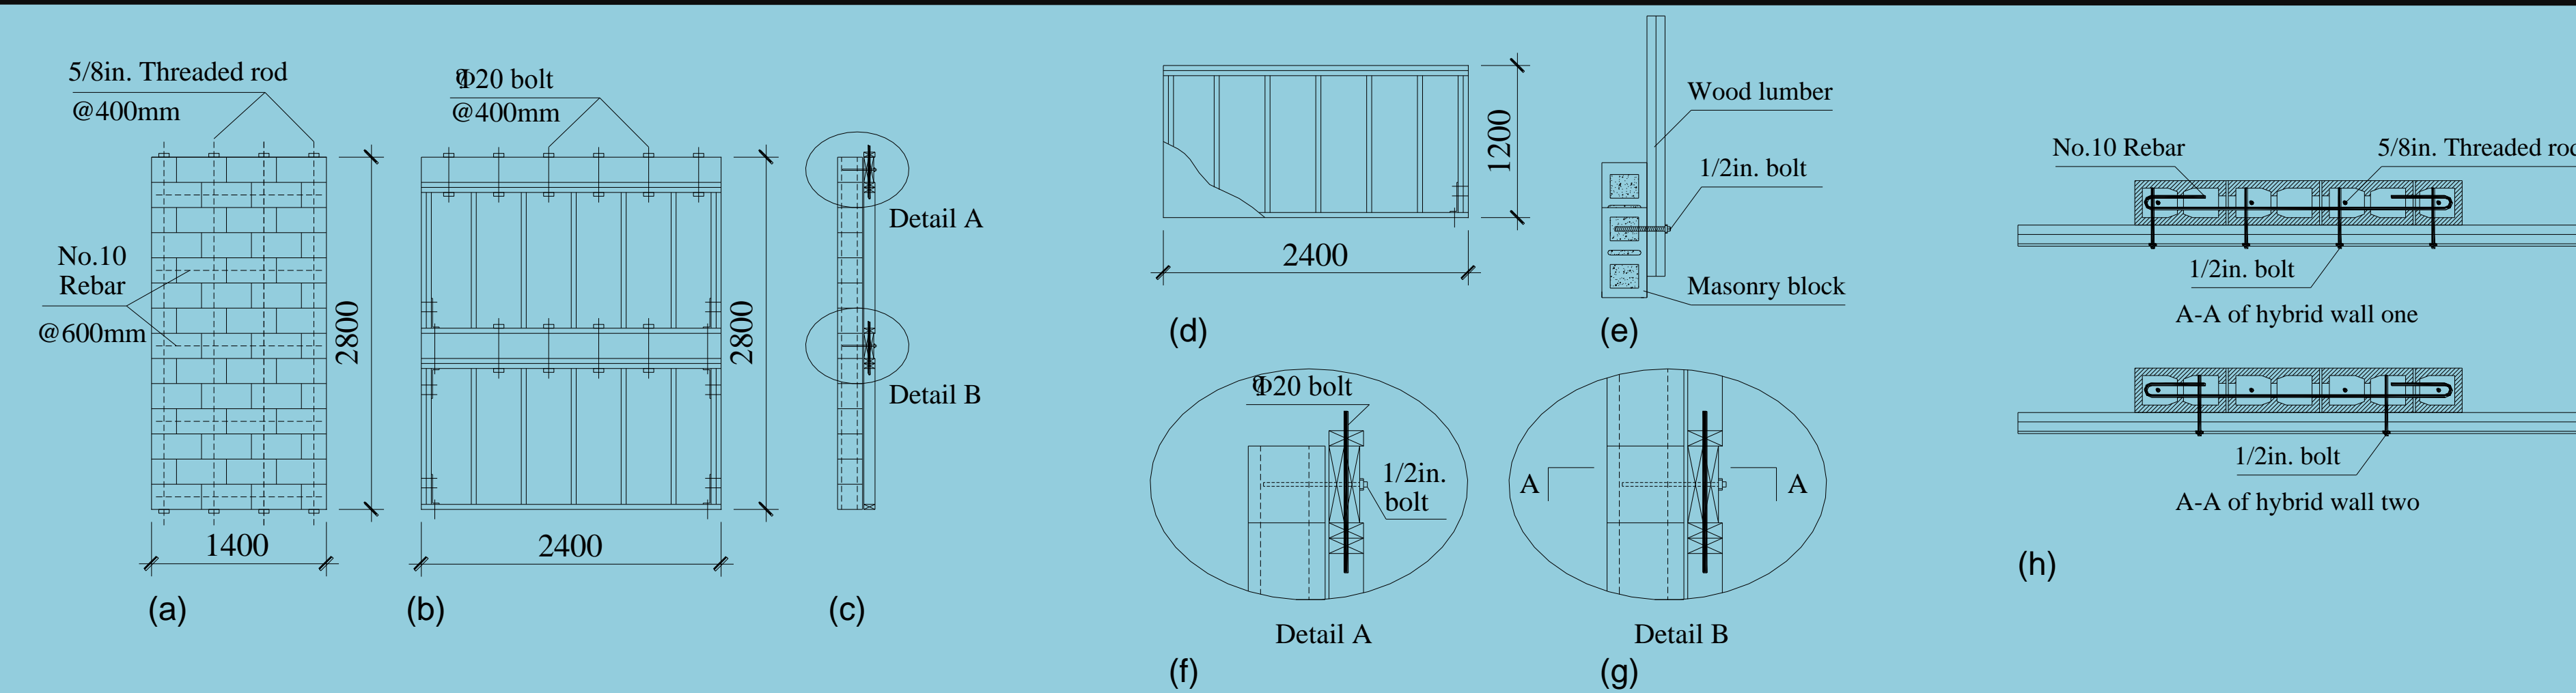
Wall configurations: (a) masonry sub-system of hybrid wall; (b) wood sub-system of hybrid wall; (c) side view of hybrid wall; (d) one-storey wood wall; (e) wood-masonry connection; (f) Detail A; (g) Detail B; (h) cross section of hybrid walls
